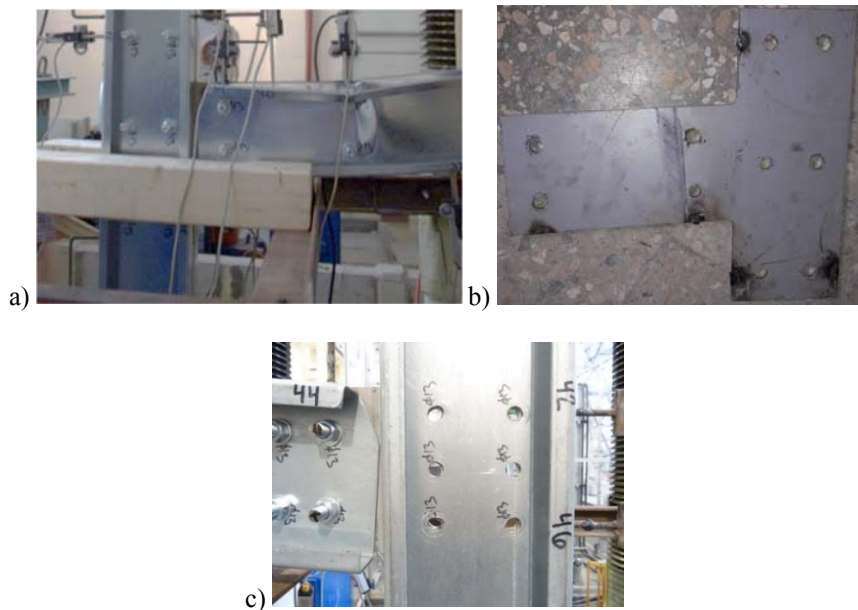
Laboratory investigation failure modes of the specimens: a) local buckling of cold-formed elements; b) yielding of gusset plate; c) bearing of cold-formed elements
